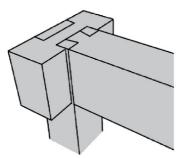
The dovetail joist for the test specimen (drawn by Emre ILGIN).
